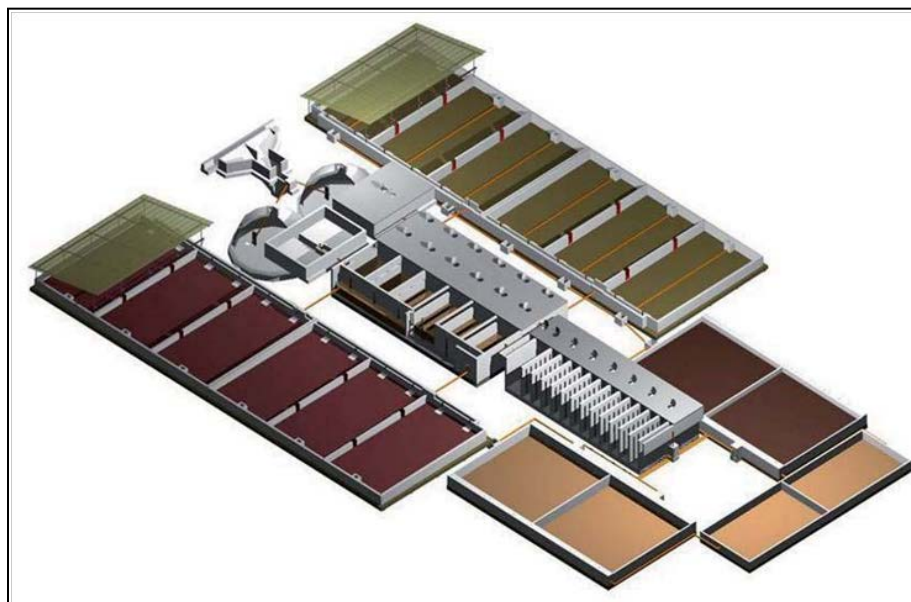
Preliminary Design for Proposed Public Sanitation Facility near Bailey Bridge
